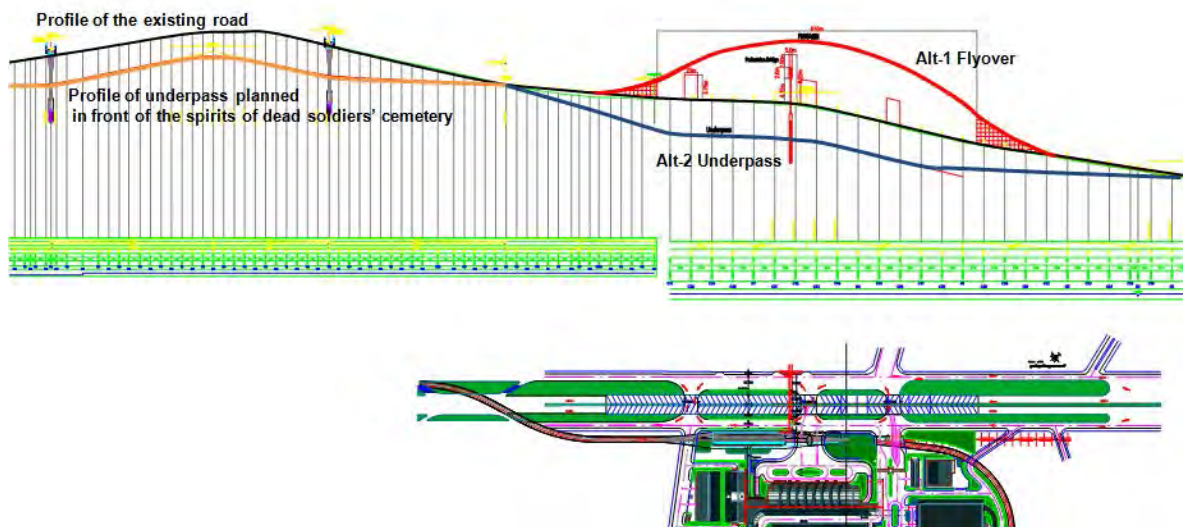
Future Plan of QL1A based on the Existing Plan
